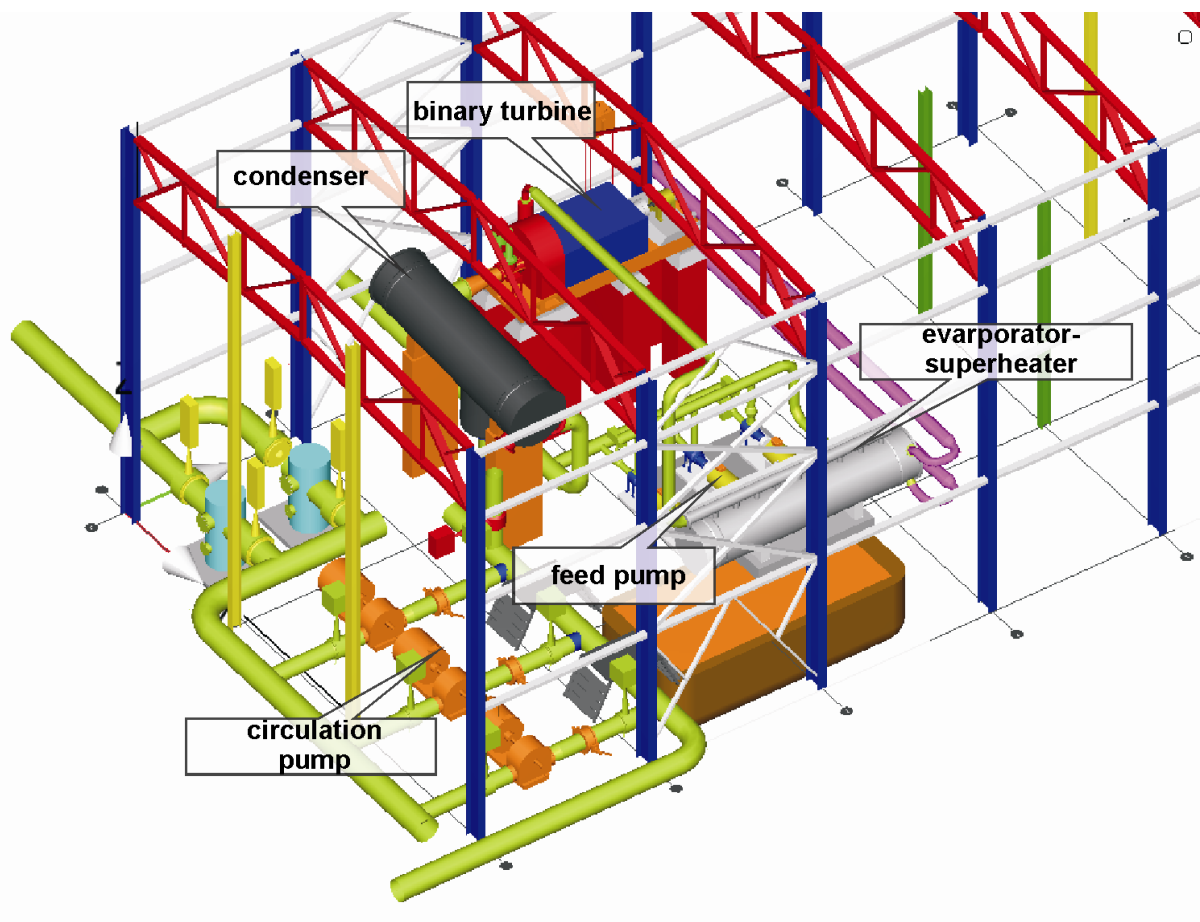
Layout solutions for placement of equipment within Pauzhetsky BGeoPP building
